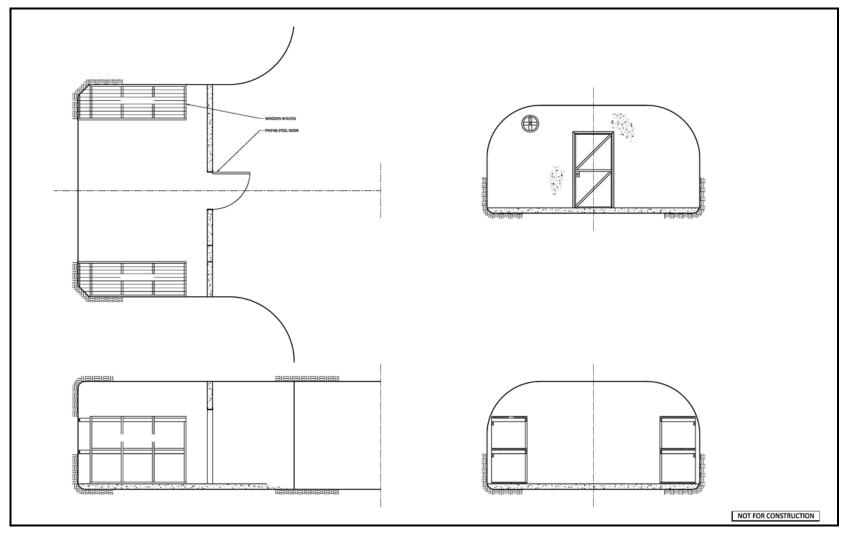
Bulk Emulsion Storage - Plan and Sections
